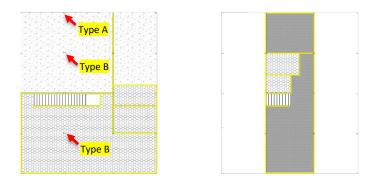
Ground (left) and mezzanine floor (right) internal layout plans showing location of 100mm thick Hebel block walls.
